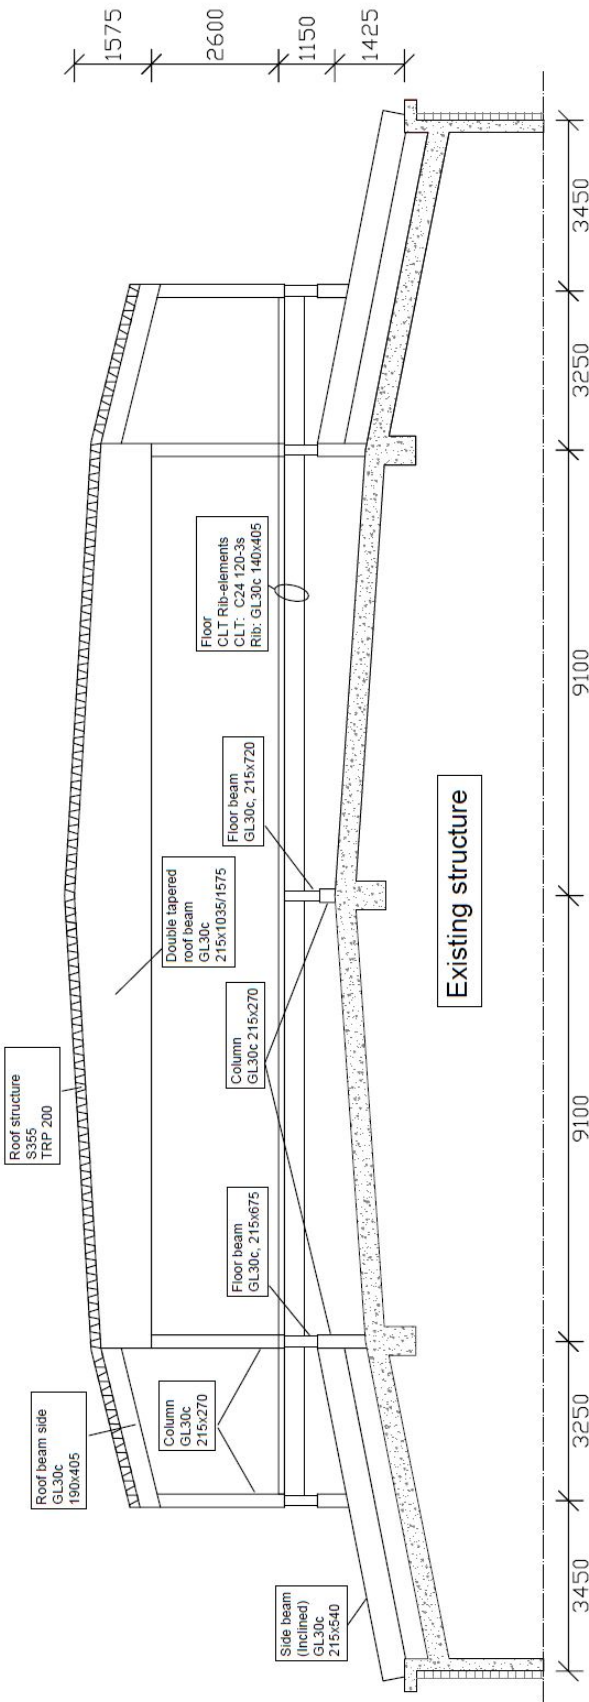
Section view on how the new floor is built on top of the existing building. Including sizes of main structural elements.
